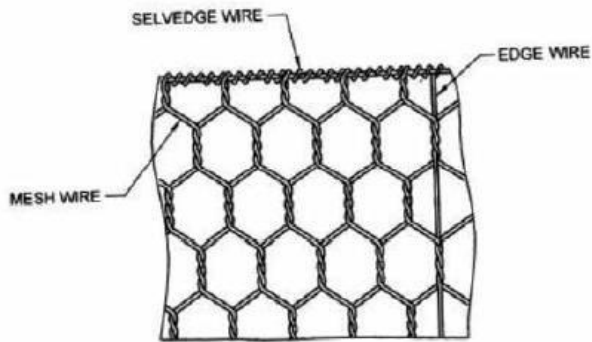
Details of Mesh Wire, Selvedge and Edge Wire
